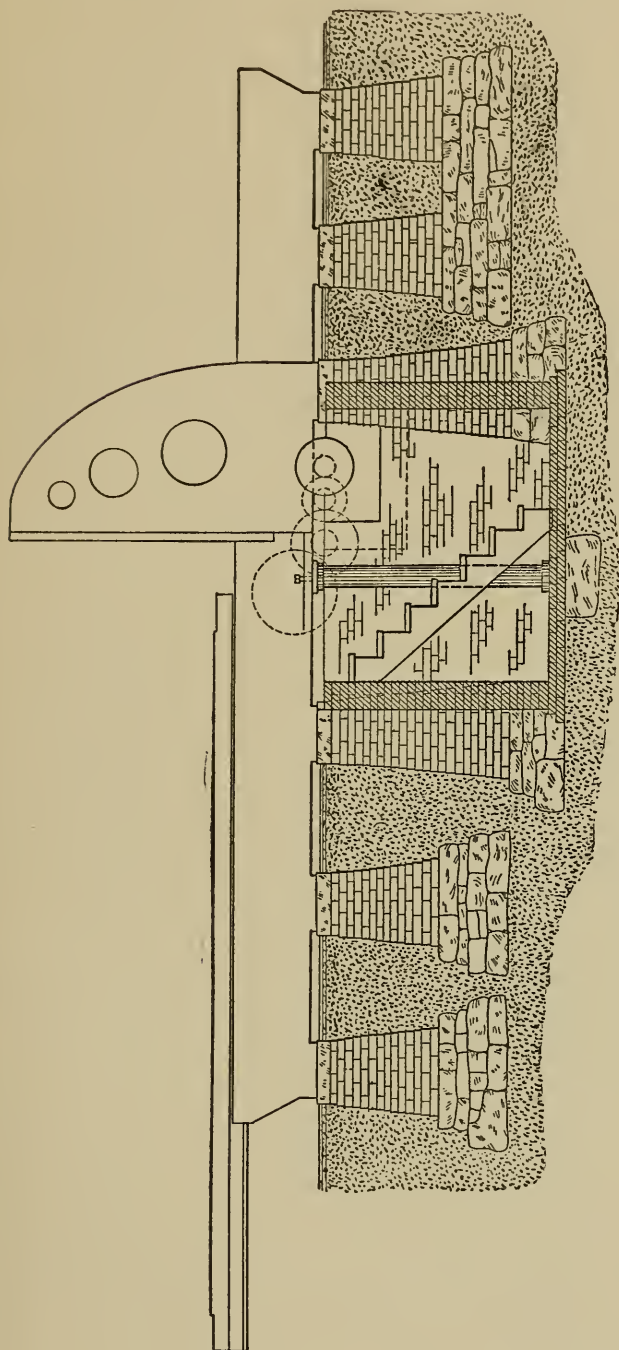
Vertical, Longitudinal Section of Planer Foundation.
